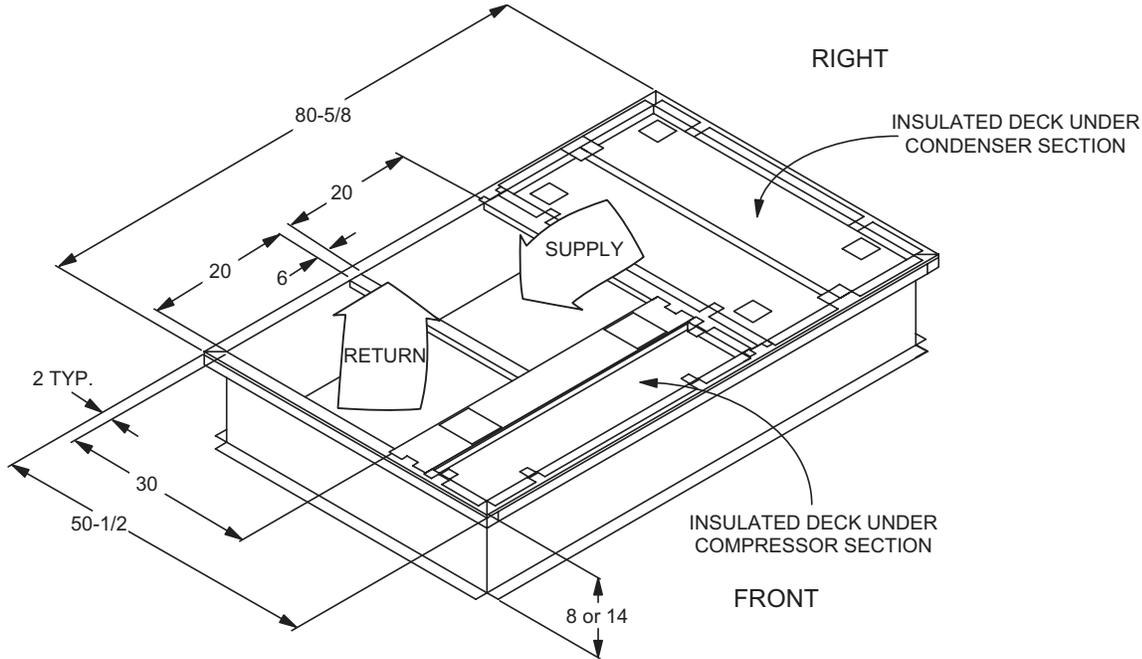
PREDATOR® ROOF CURB DIMENSIONS
